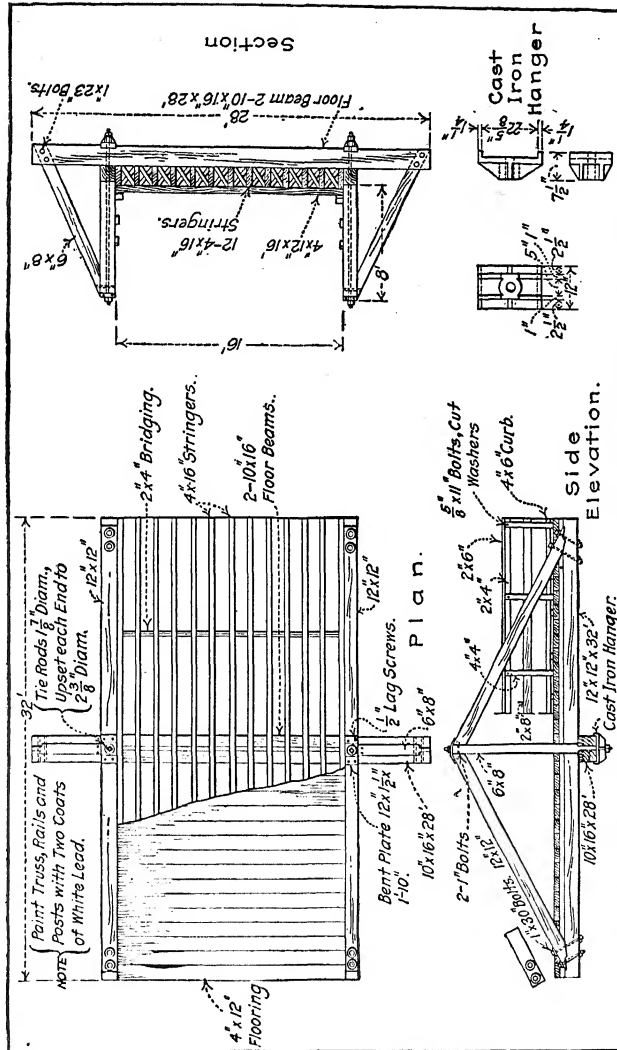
30 ft. span king post timber bridge. State of Wyoming.
